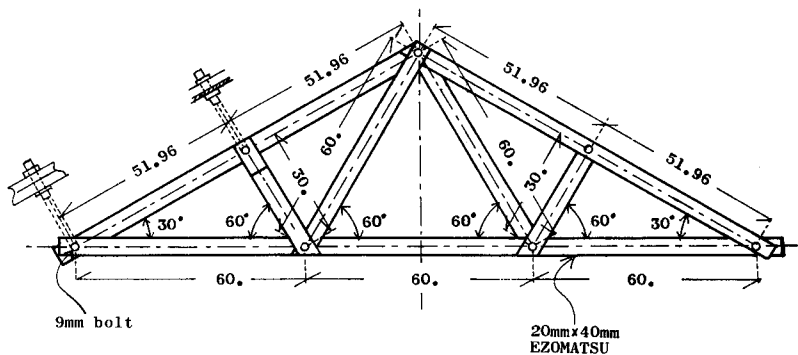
Small scale wooden fink trusses joined with bolts (Truss 1 and 2). (unit: cm)
